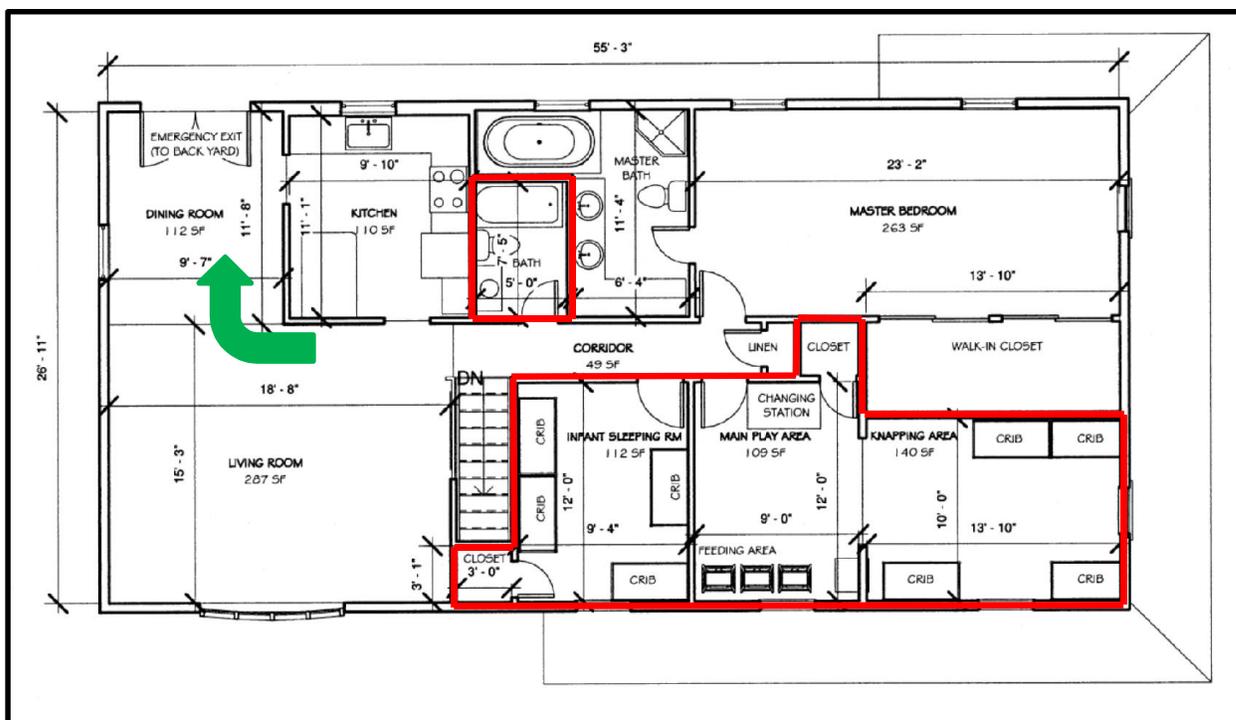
Home Child Care layout on upper level. Primary rooms used are highlighted. The arrow shows the primary emergency exit route. Source: Applicant.
